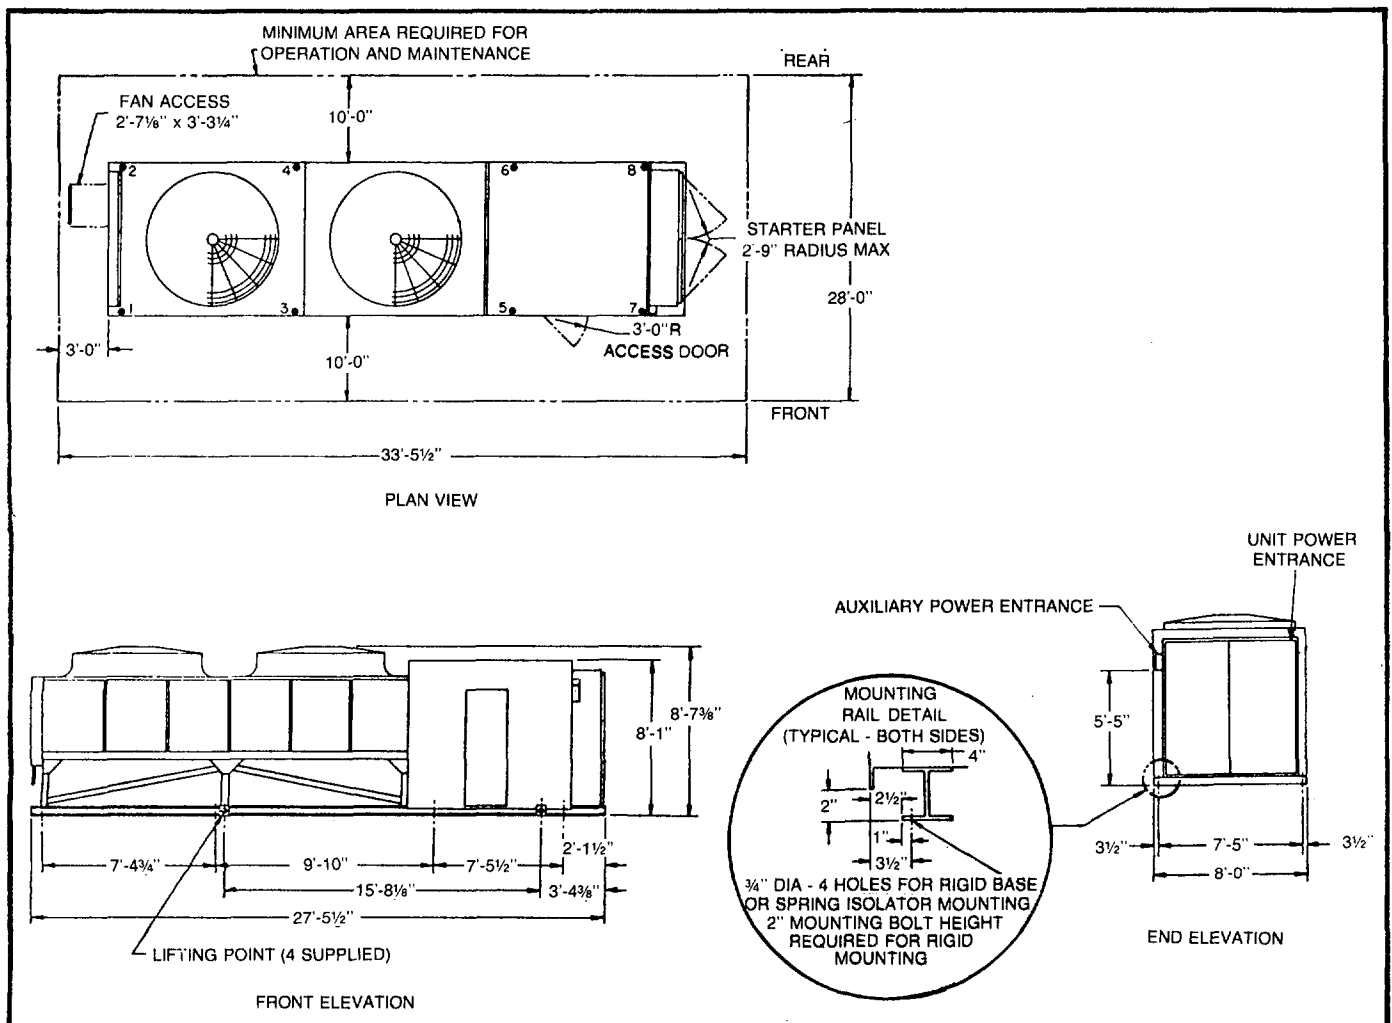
Unit Dimension For: CVAC-013 with A1 Evaporator and A Condenser
